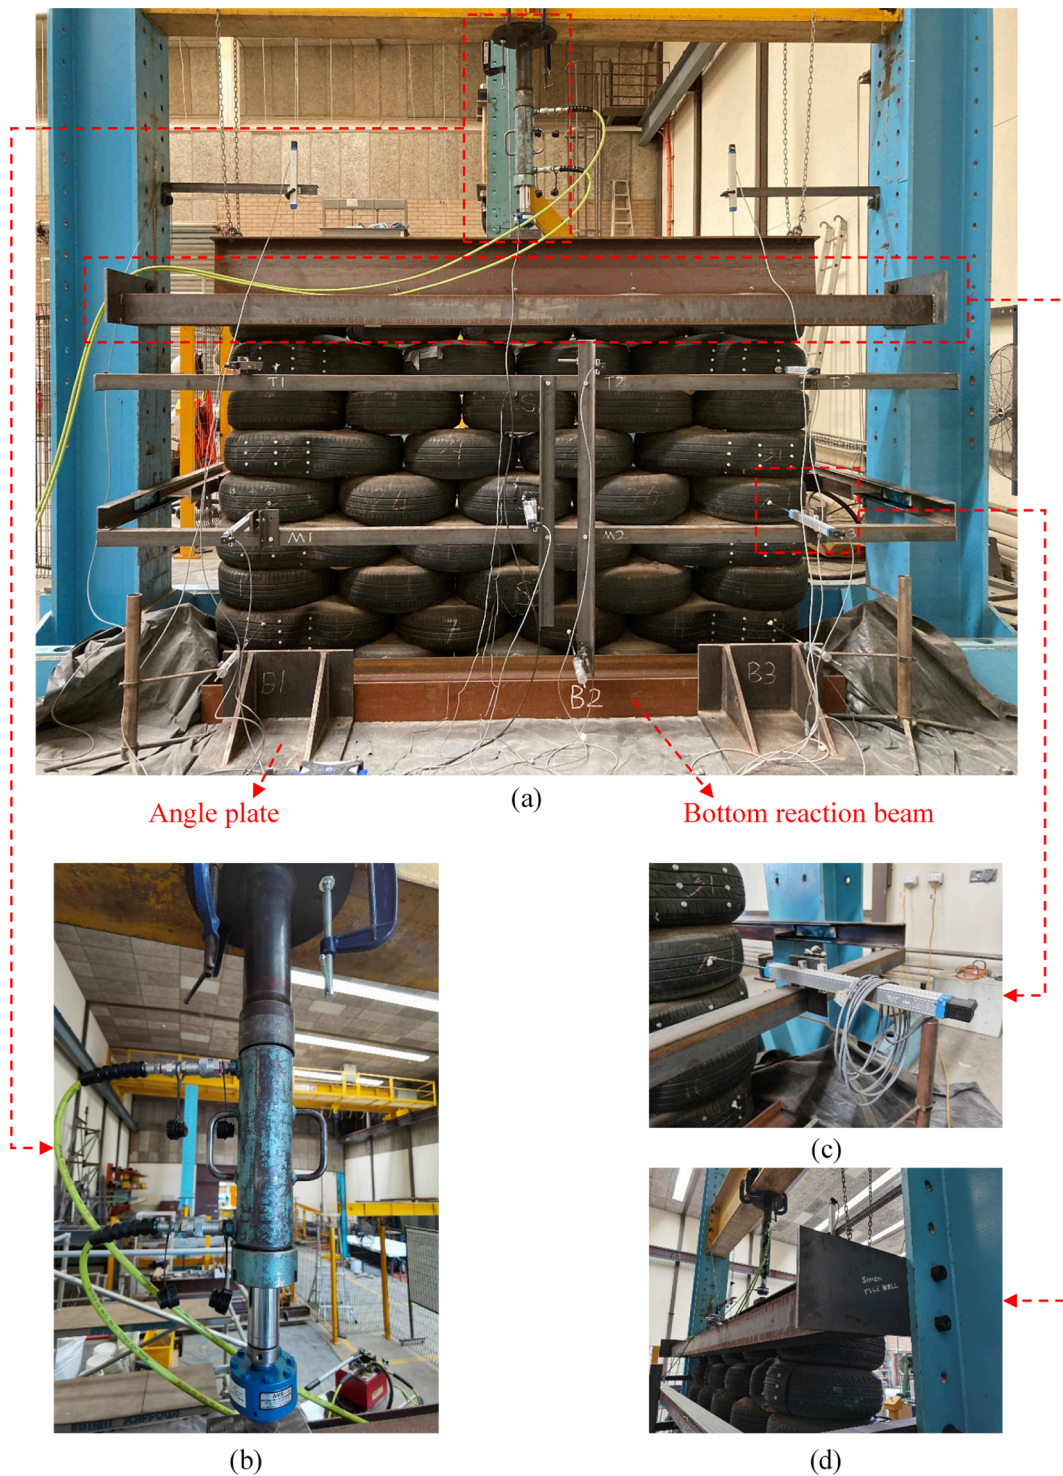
Backside test setup: (a) overall view; (b) axial loading actuator; (c) lateral LVDT; (d) bolt connection of the top reaction beam with steel plate welded at the end.
